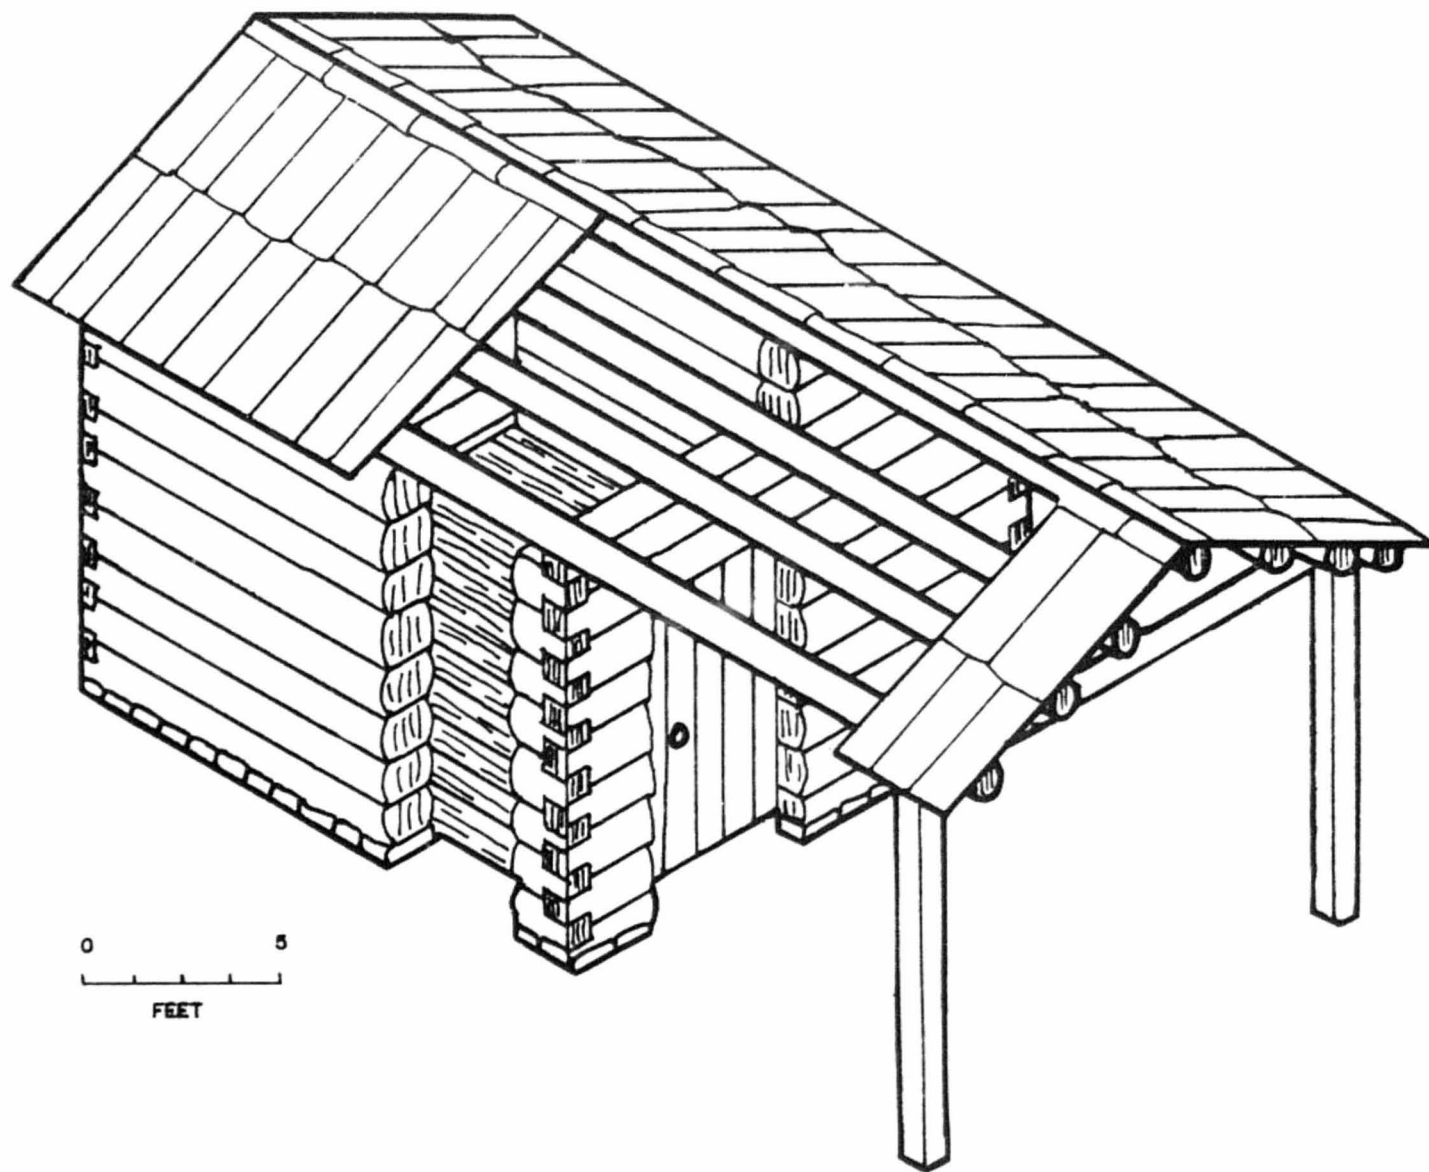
Cutaway axonometric drawing of a typical Rocky Mountain Cabin.
